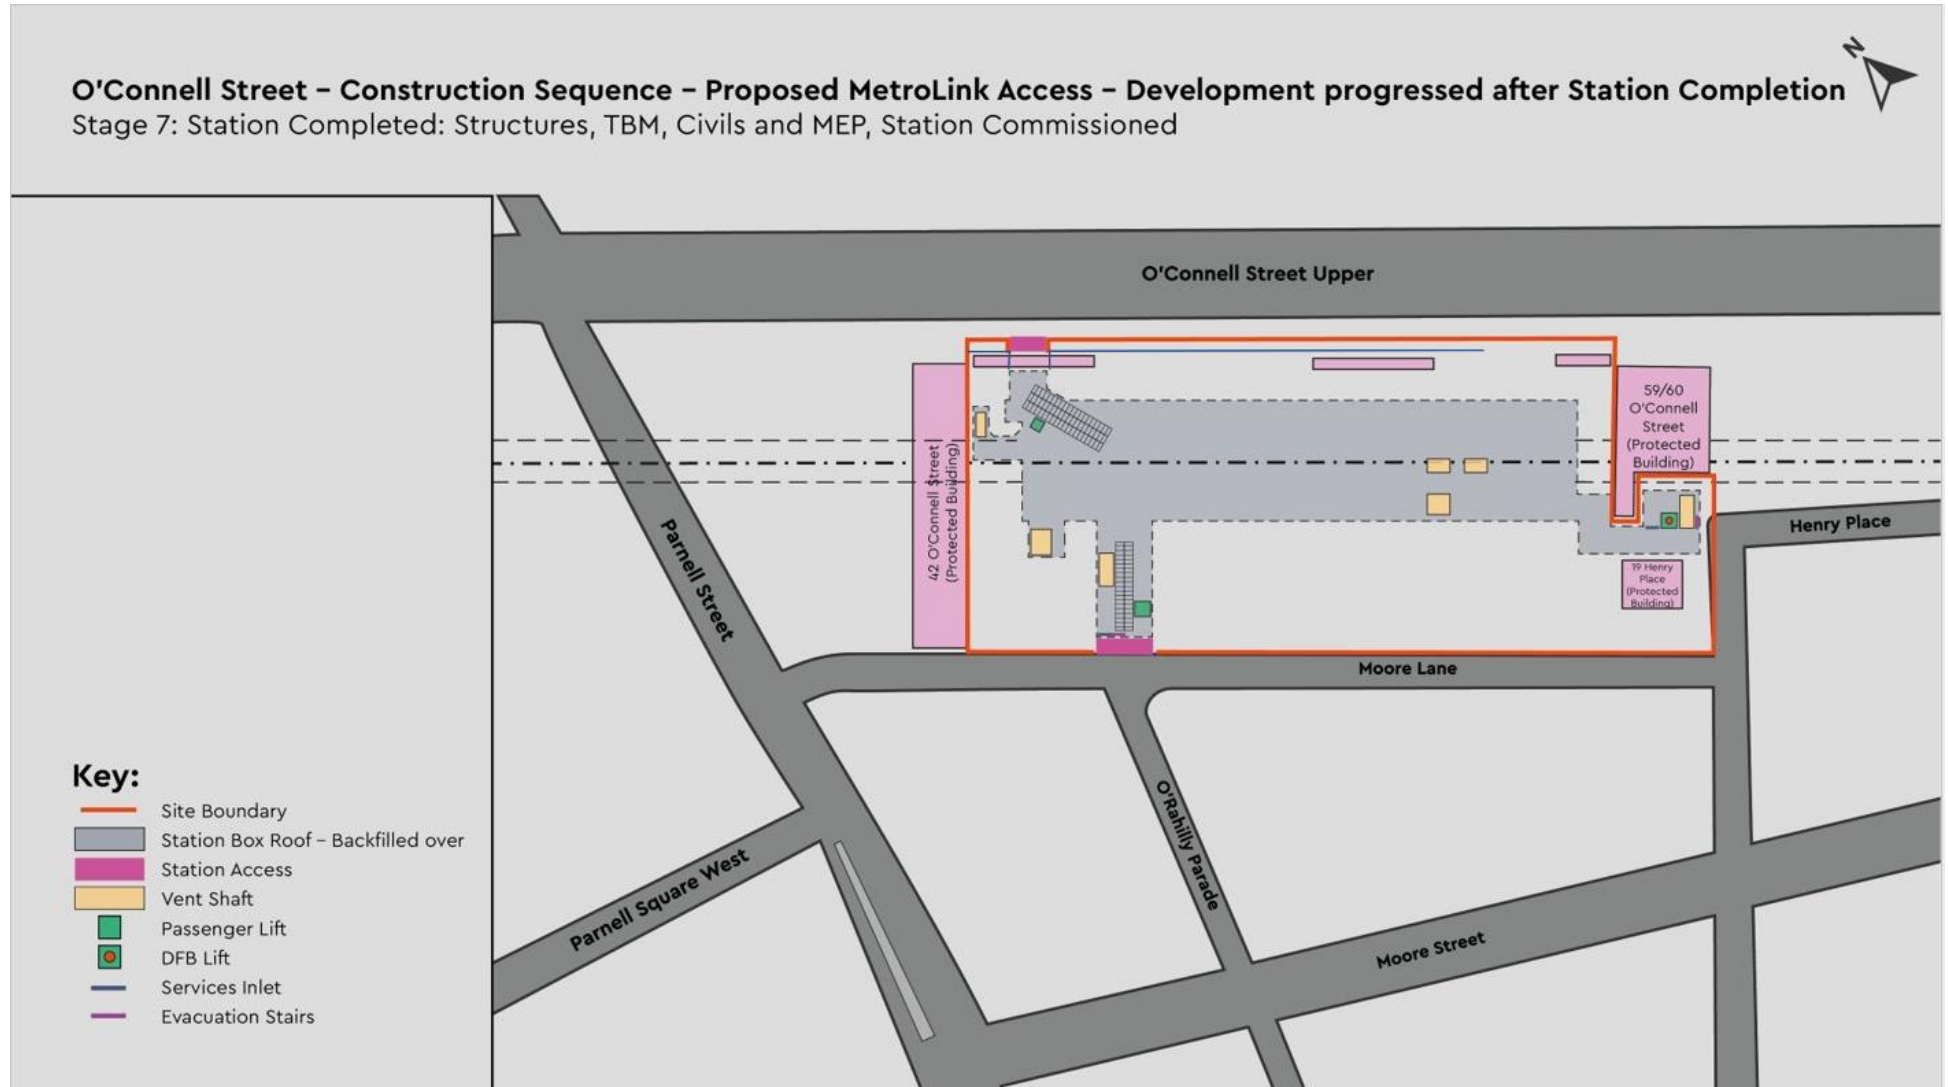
O'Connell Street Stage 7 - Station completed: Structures, TBM, Civils and MEP, Station commissioned
